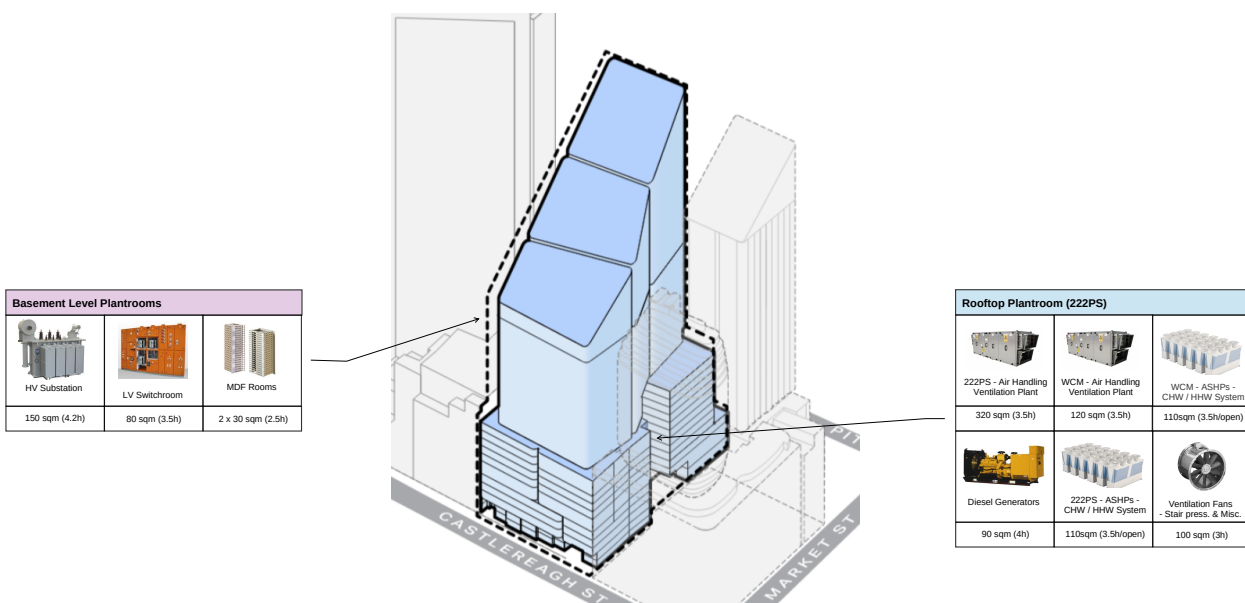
222 Pitt Street Tower Plantroom Massing (Commercial Scheme)
